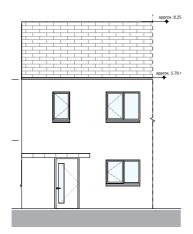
2-Bed Unit Front Elevation (not to scale)
